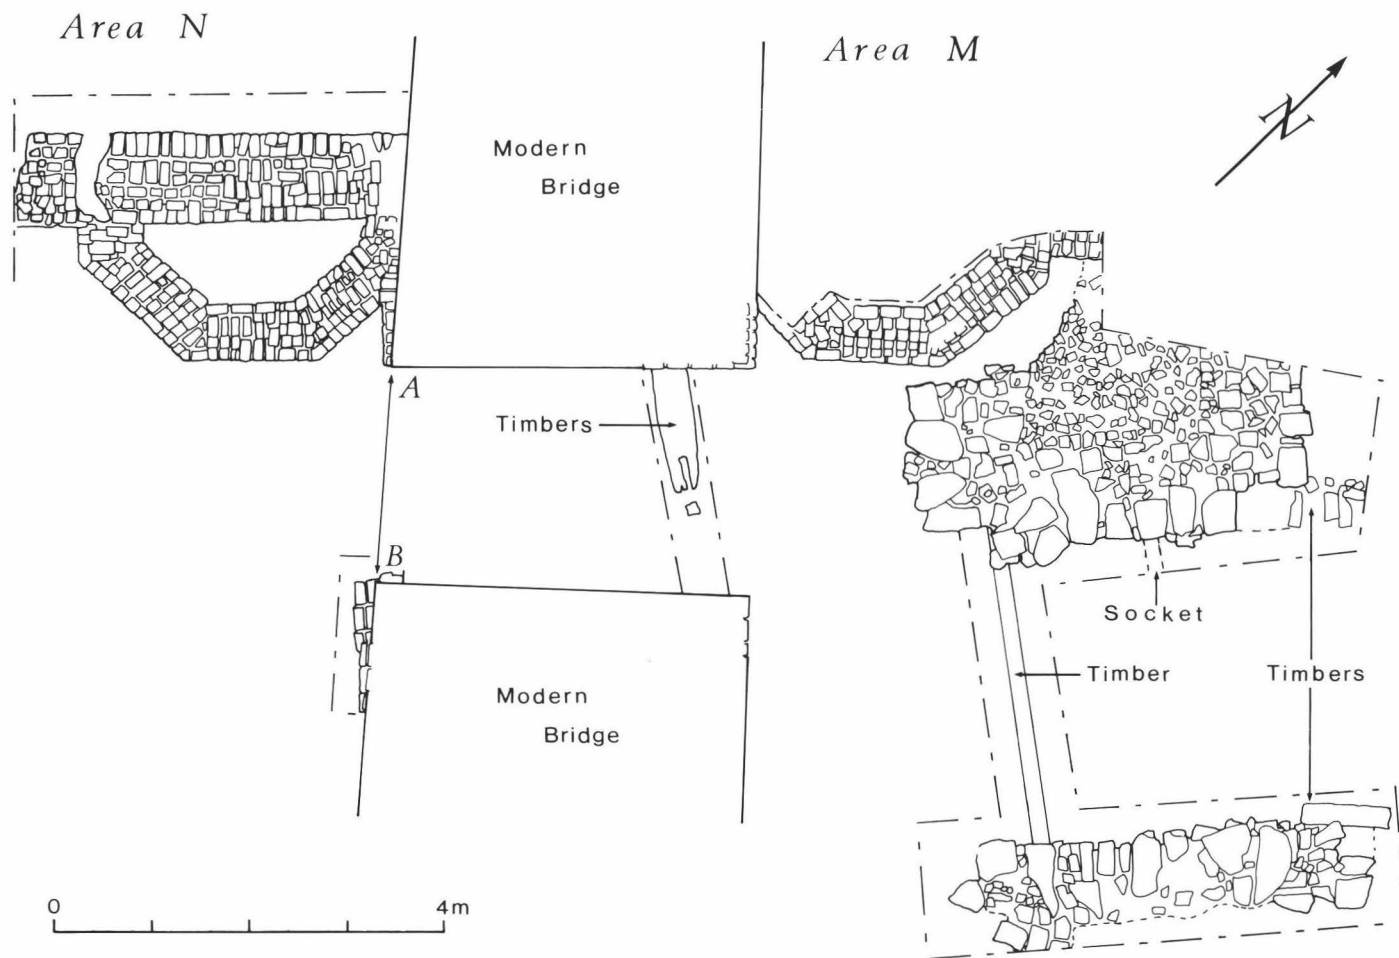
Laughton Place, 1984. Plan of modern entrance bridge, brick Tudor wall-projections and ?late 16th-century bridge foundations.
